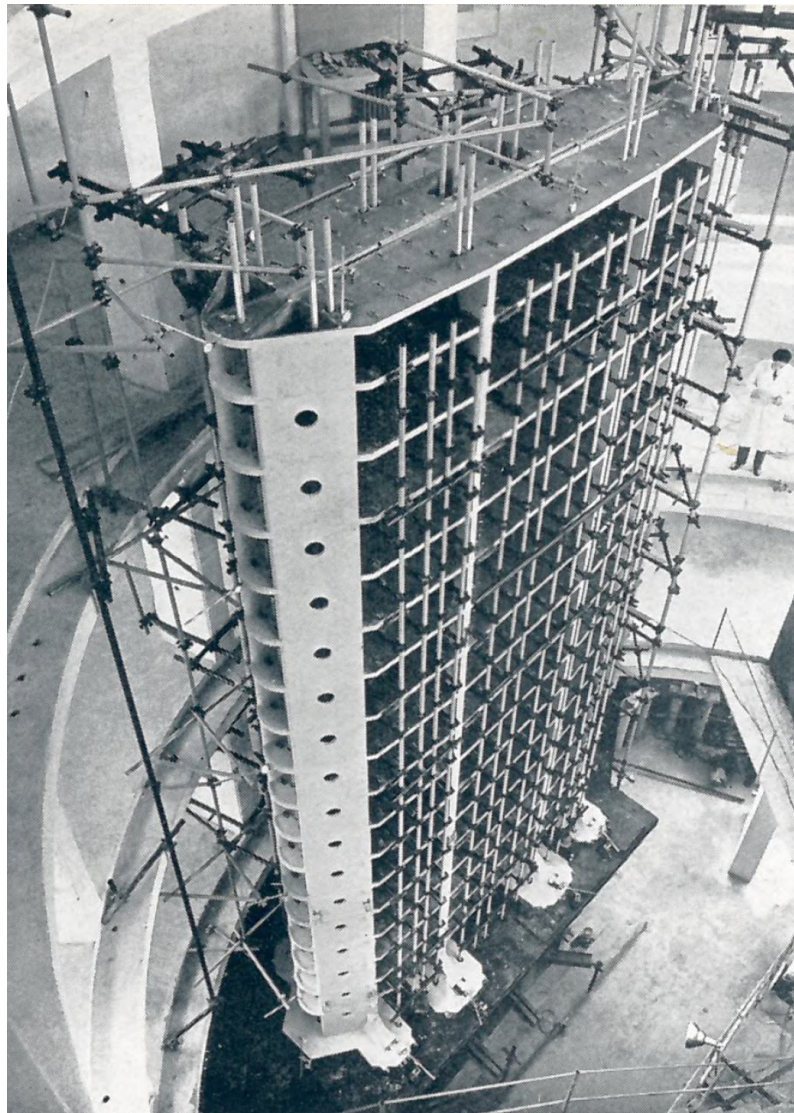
Pirelli building in Milano, Ponti and Nervi, 1960. Source: own shoot.
